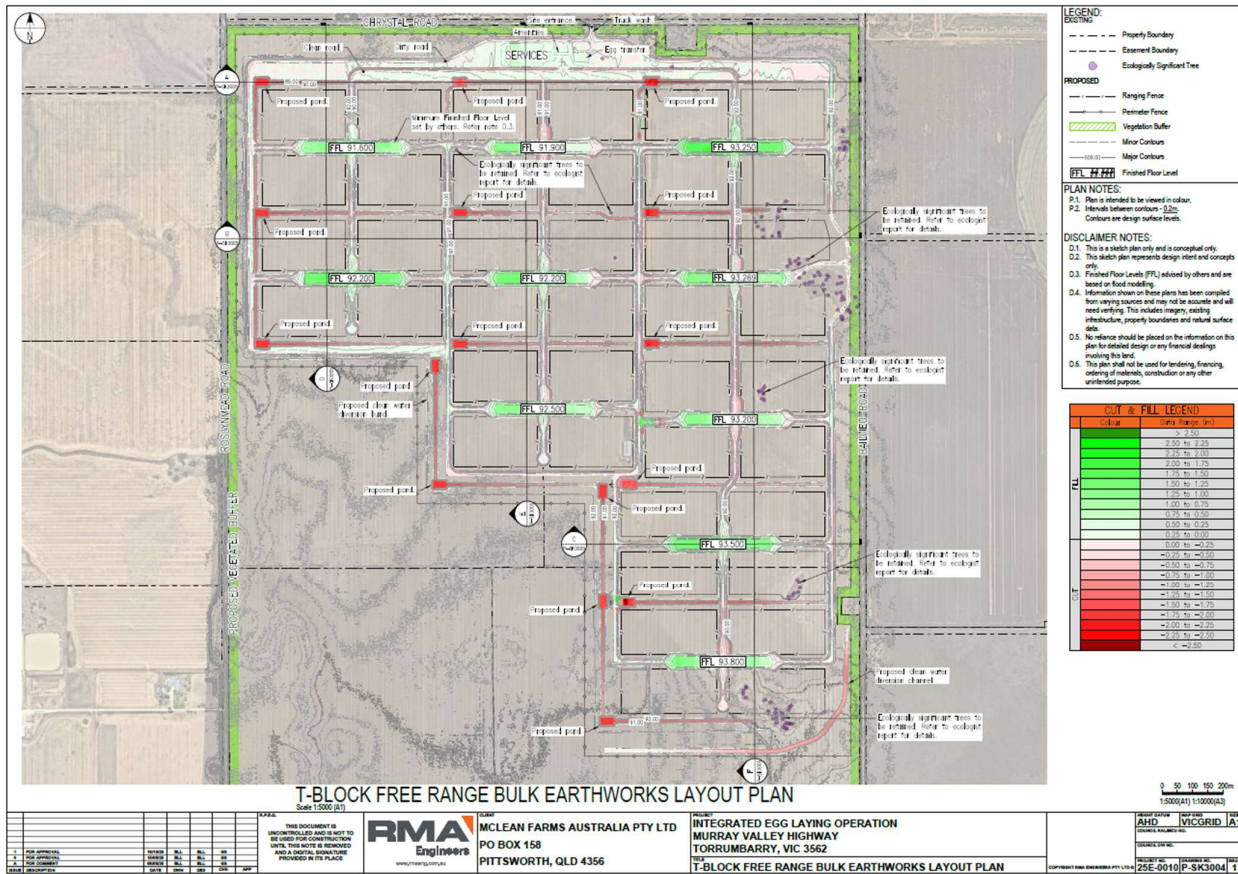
Earthworks Layout Plan (RMA Engineers, 2025)
